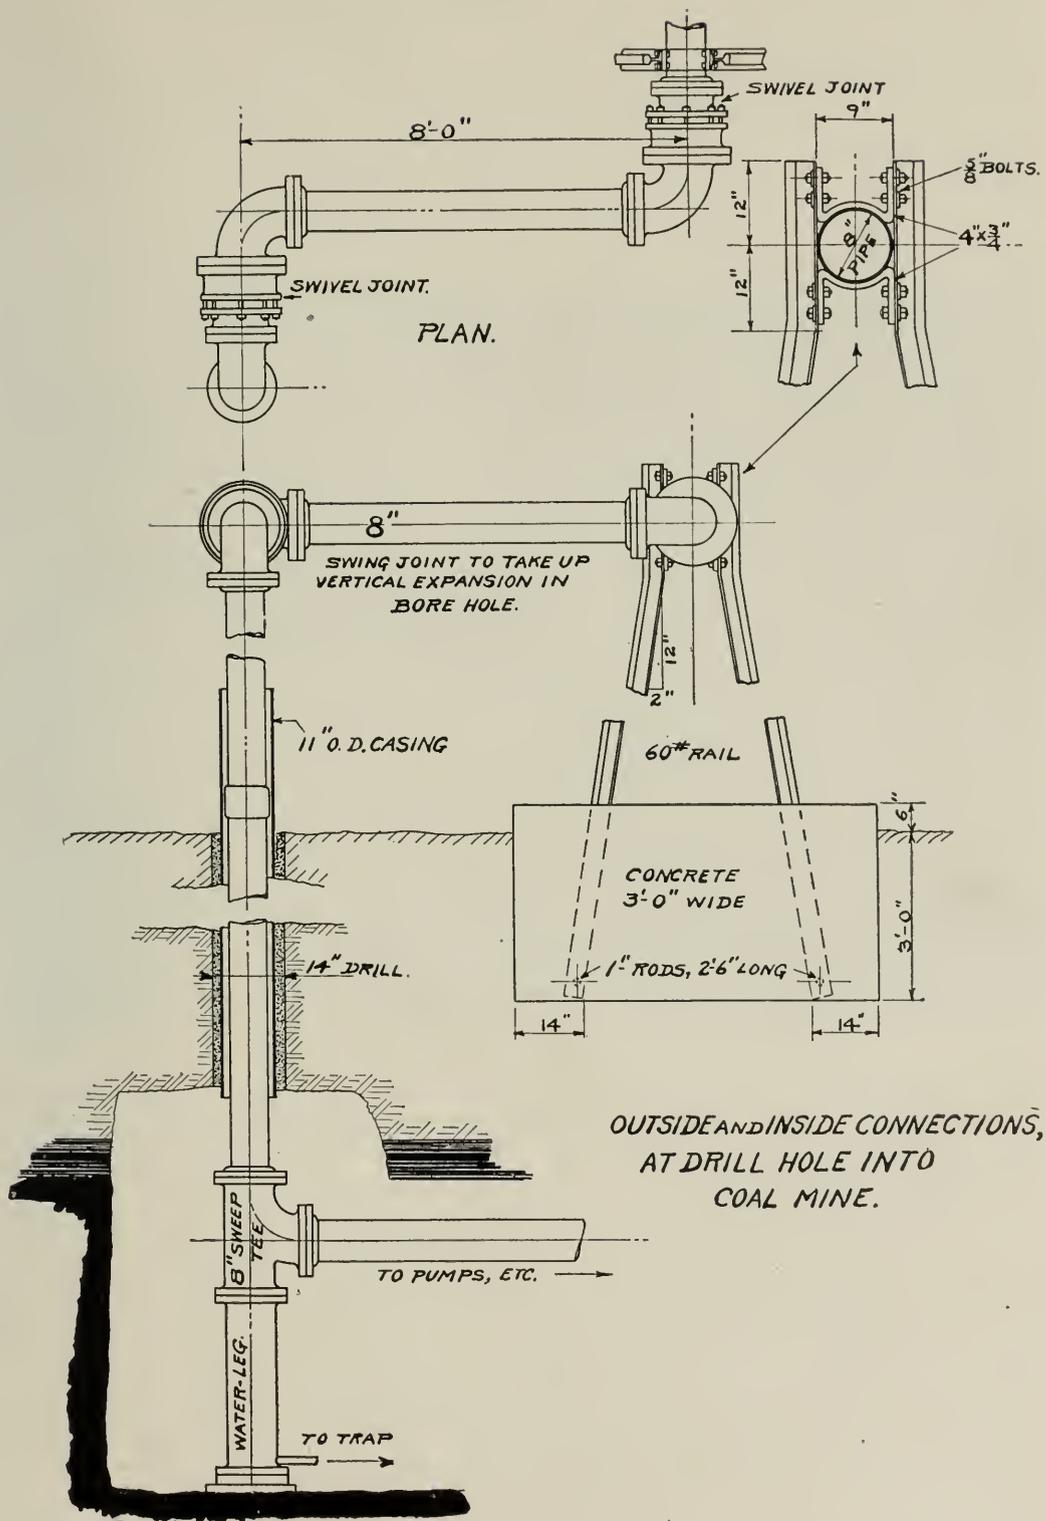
FIG. H. OUTSIDE AND INSIDE CONNECTIONS FOR A PIPE LINE ENTERING A MINE THROUGH A DRILL HOLE.
